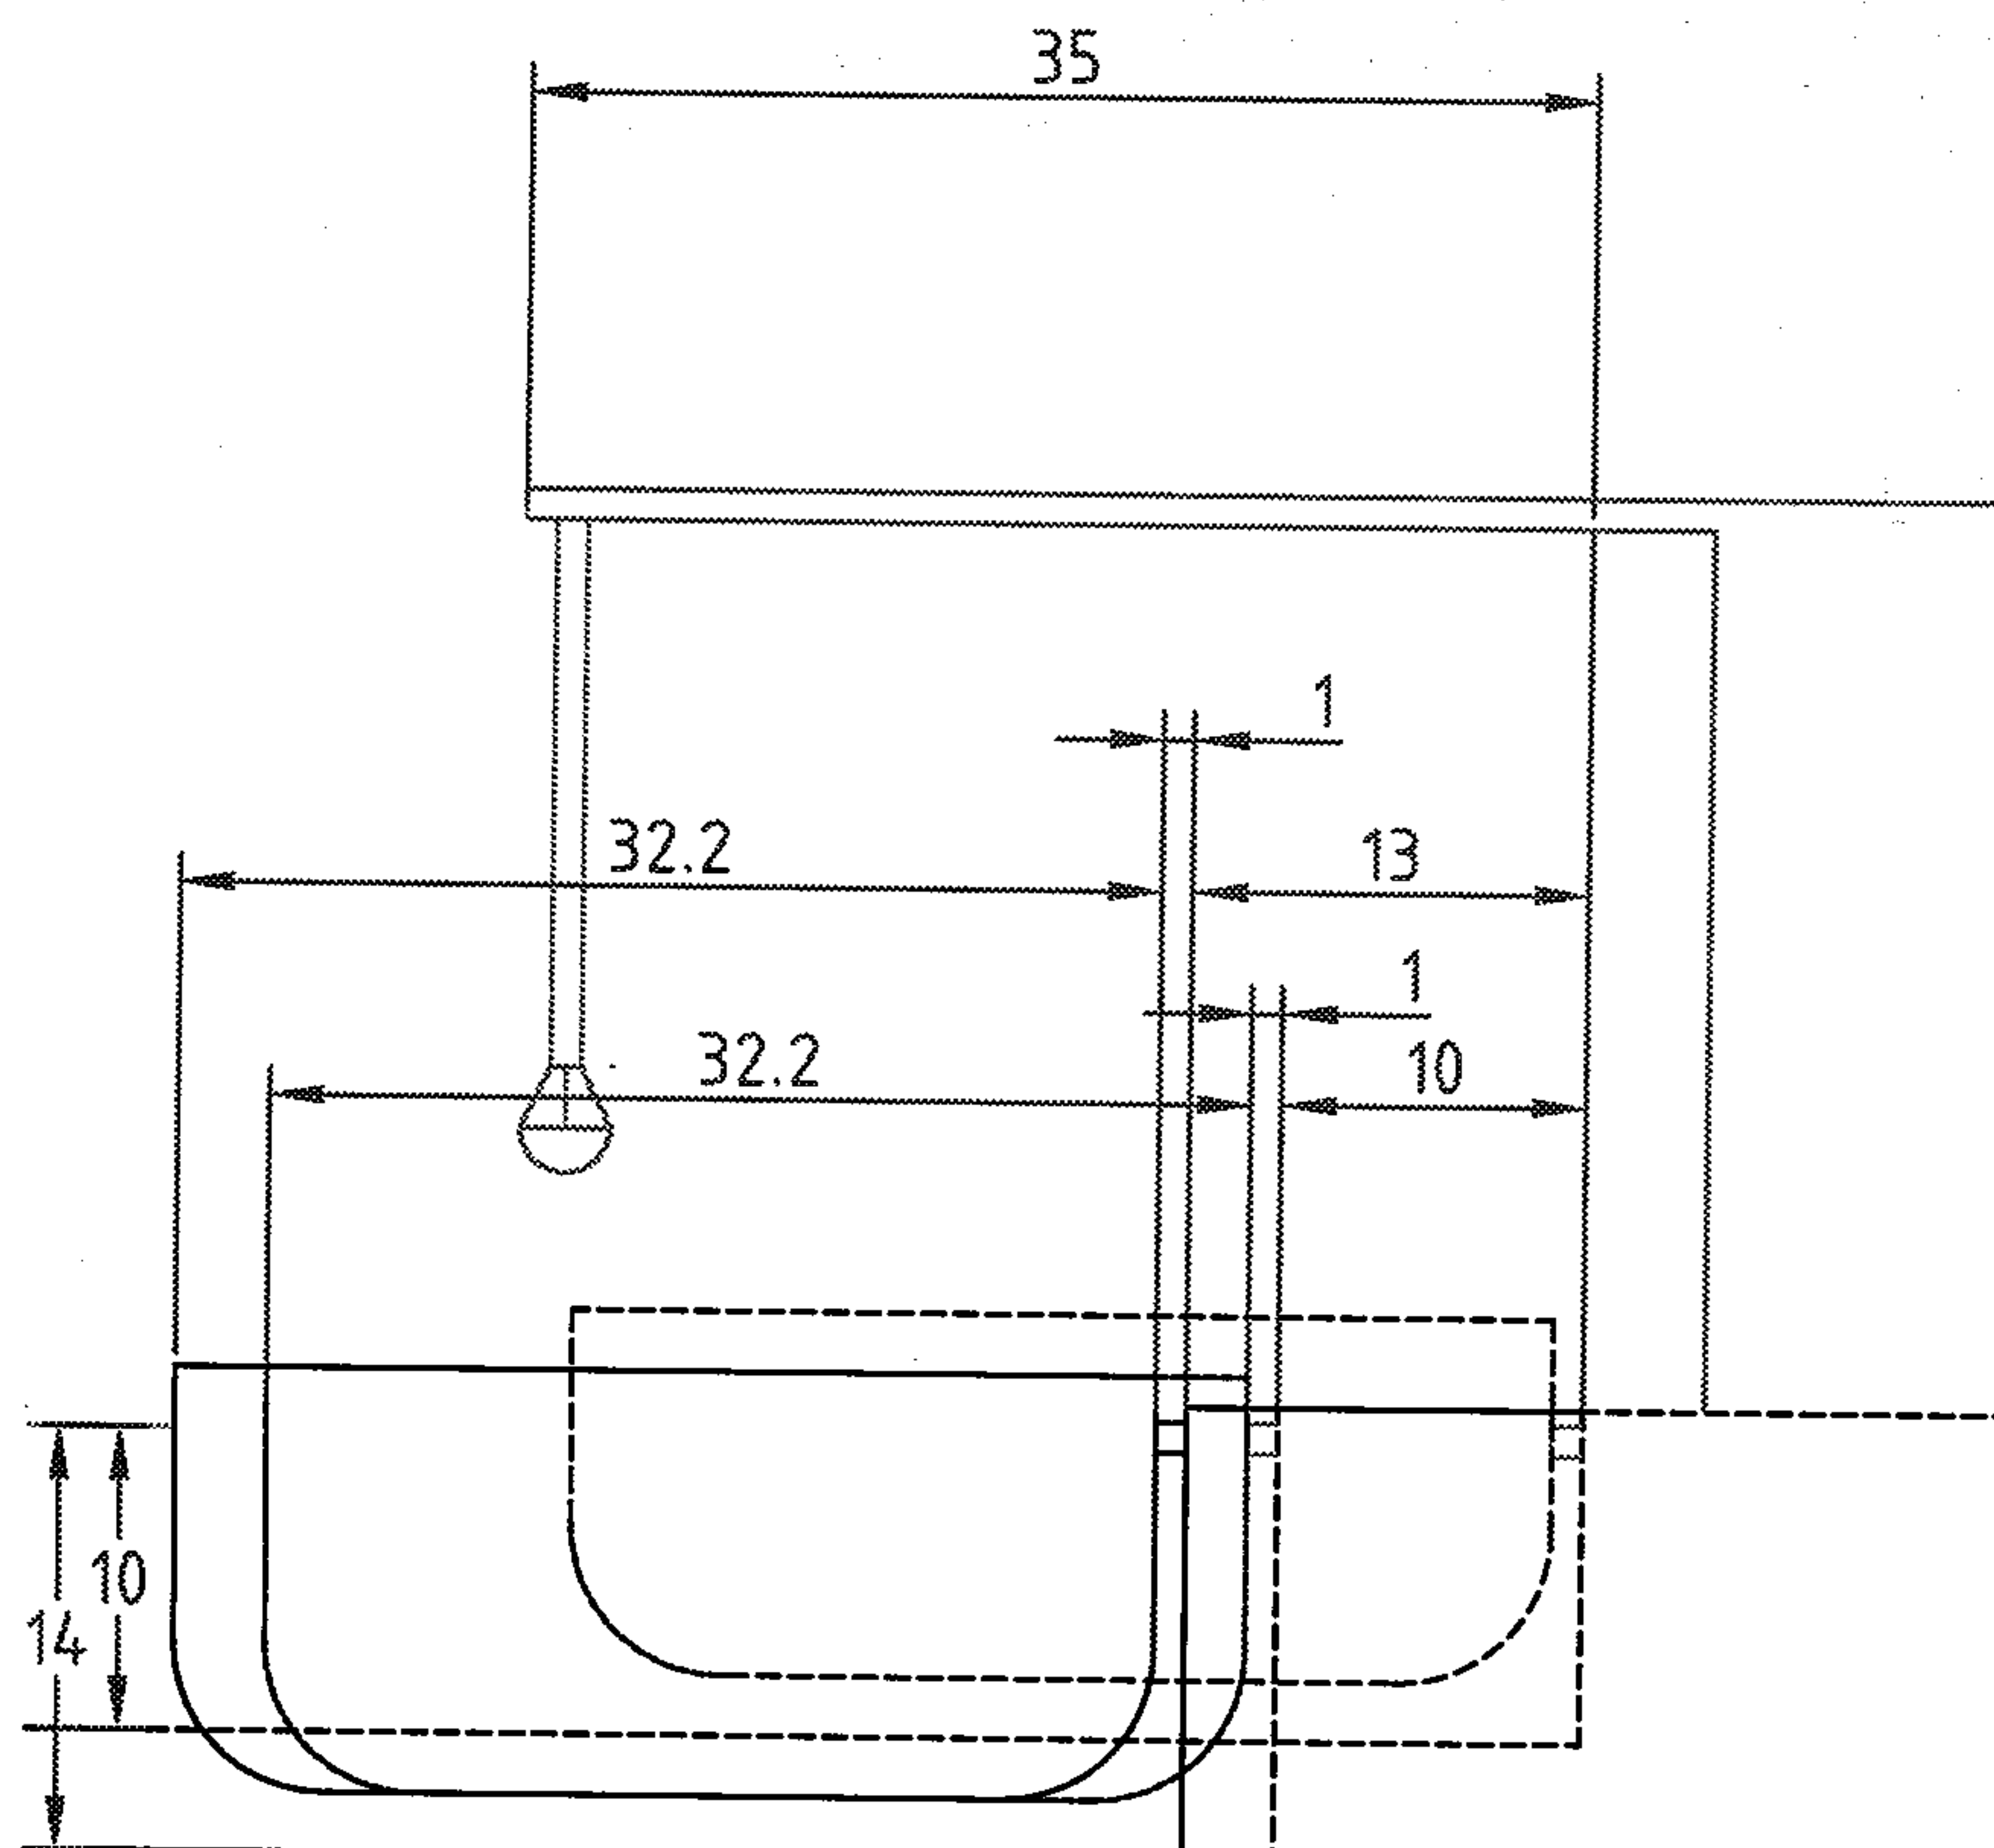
Relationship between Extension Width and Unloader's Outreach
